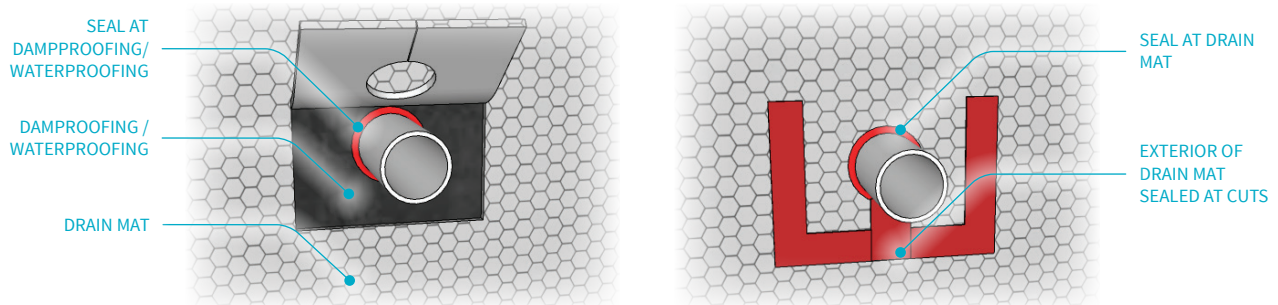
Recommended "best practice" foundation wall penetration sealing approach, with a seal installed both directly at the dampproofing/waterproofing (left) and at the drain mat, where present (right).
